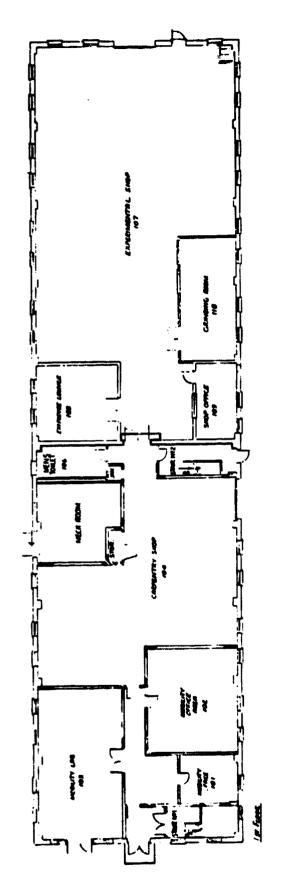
FLOOR PLAN - EXPERIMENTAL AND CARPENTRY SHOPS
